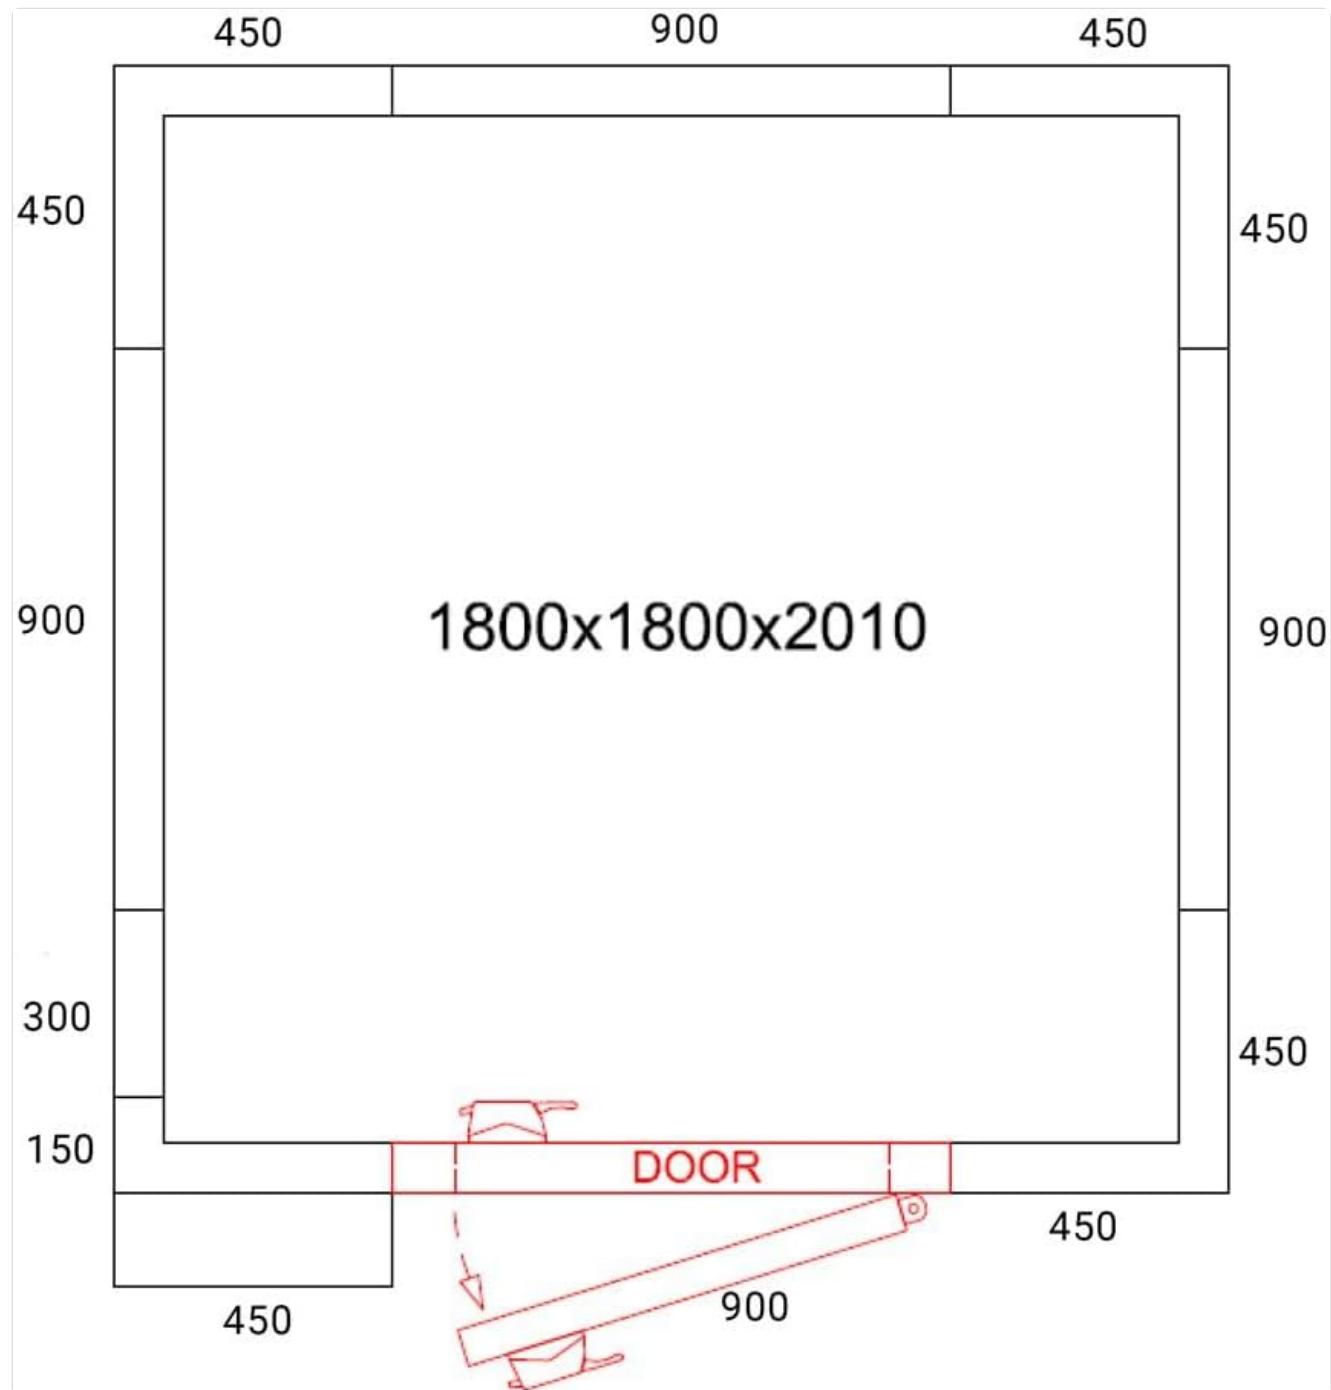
Top-down dimensional drawing of the freezer cell, indicating overall dimensions of 1800mm x 1800mm and the door placement.
